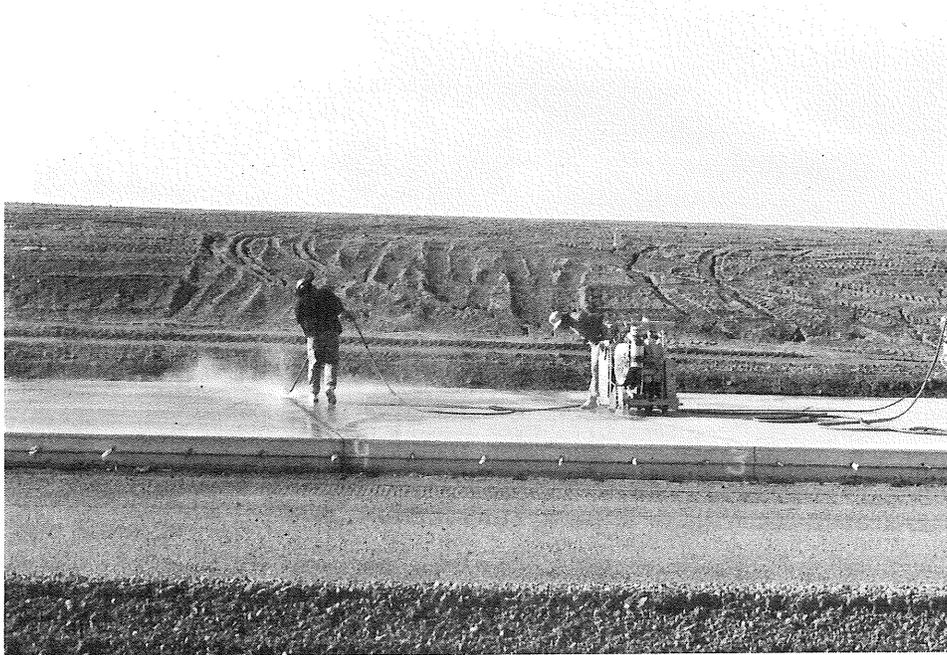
Water Jetting and Dry Sawing Transverse Joints
